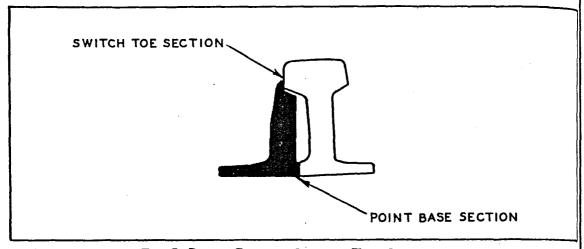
POINT BASE & SWITCH TOE SECTIONS
